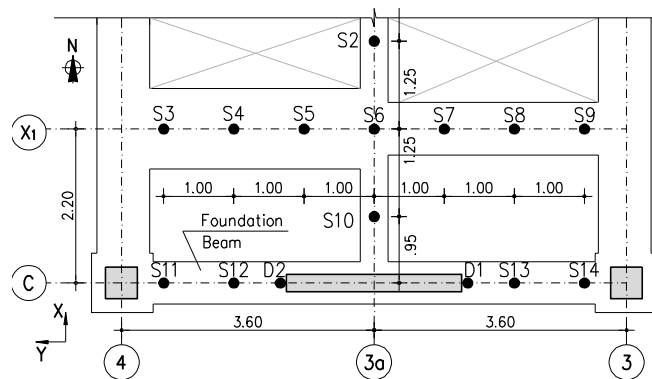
Instrumentation in second floor slab (dimensions in m)
